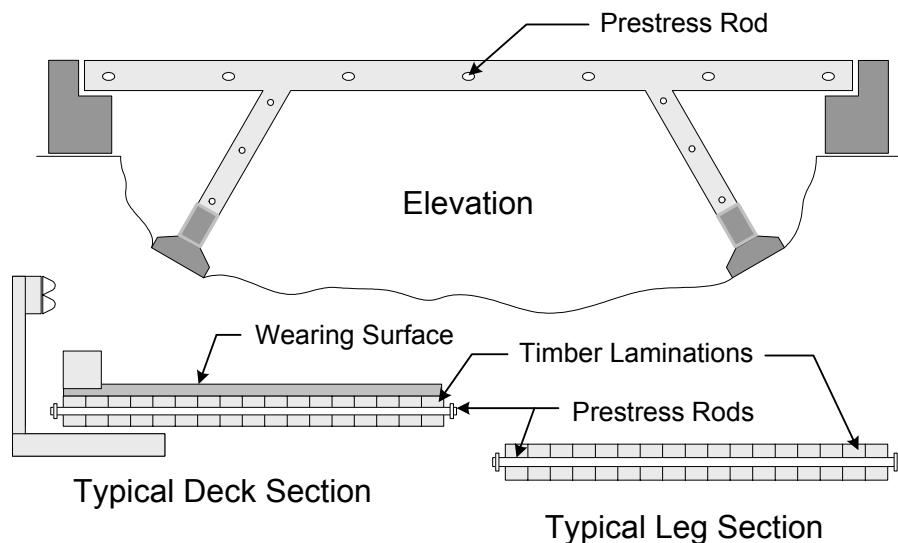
Stress-Laminated Timber K-frame Bridge
